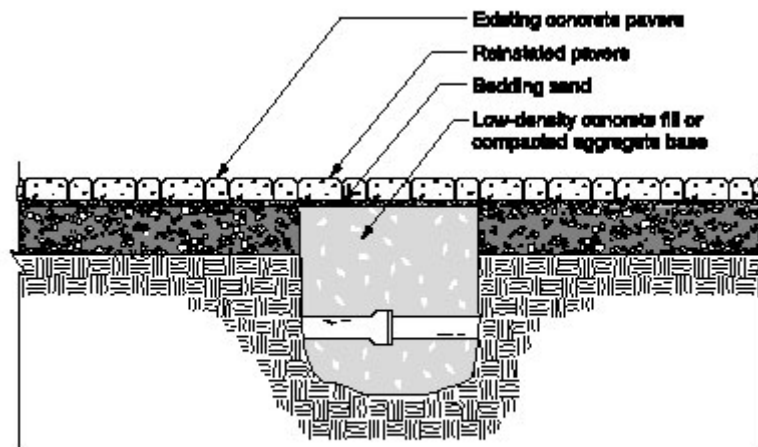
Cross section of reinstated utility cut into interlocking concrete pavement.
